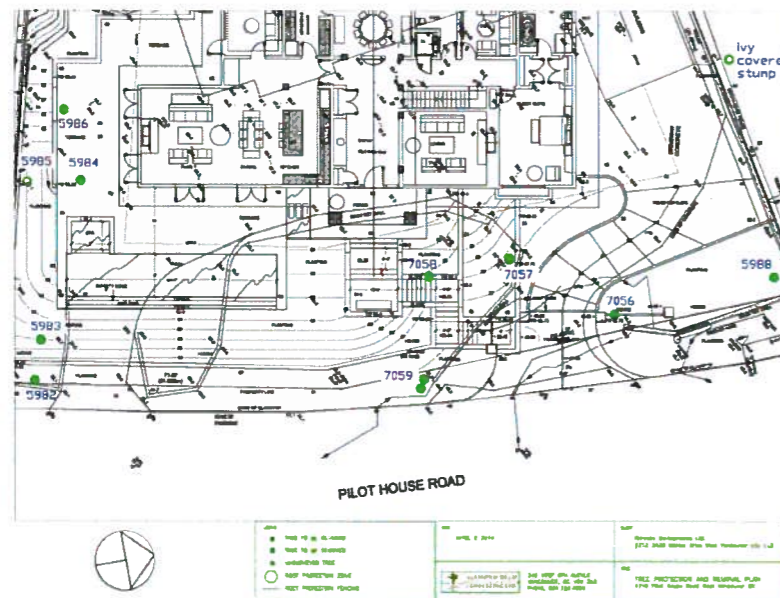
Location of the subject tree #7059 located on District property adjacent 4719 Pilot House Road West Vancouver
